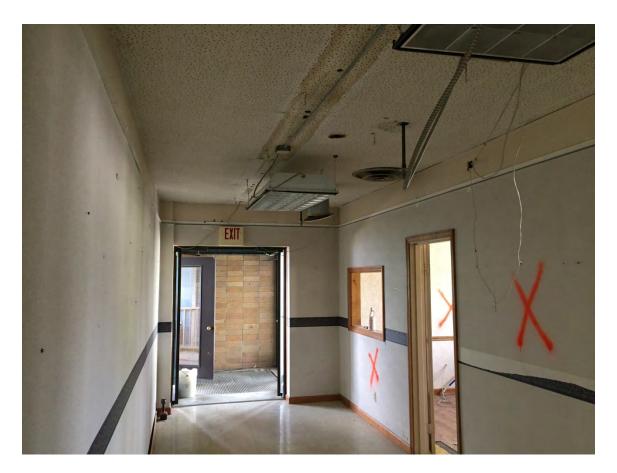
Piqua Administration Building, First Floor Office Area, Before Abatement
